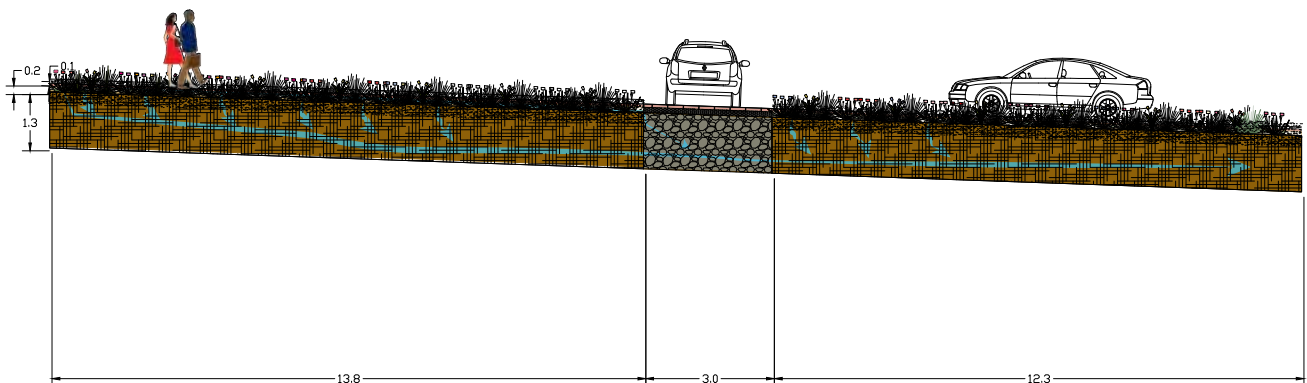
Profile view of a section of the proposal. The stormwater enters the stormwater planter through curb cutouts where it infiltrates and continues to flow through the amended soil.
